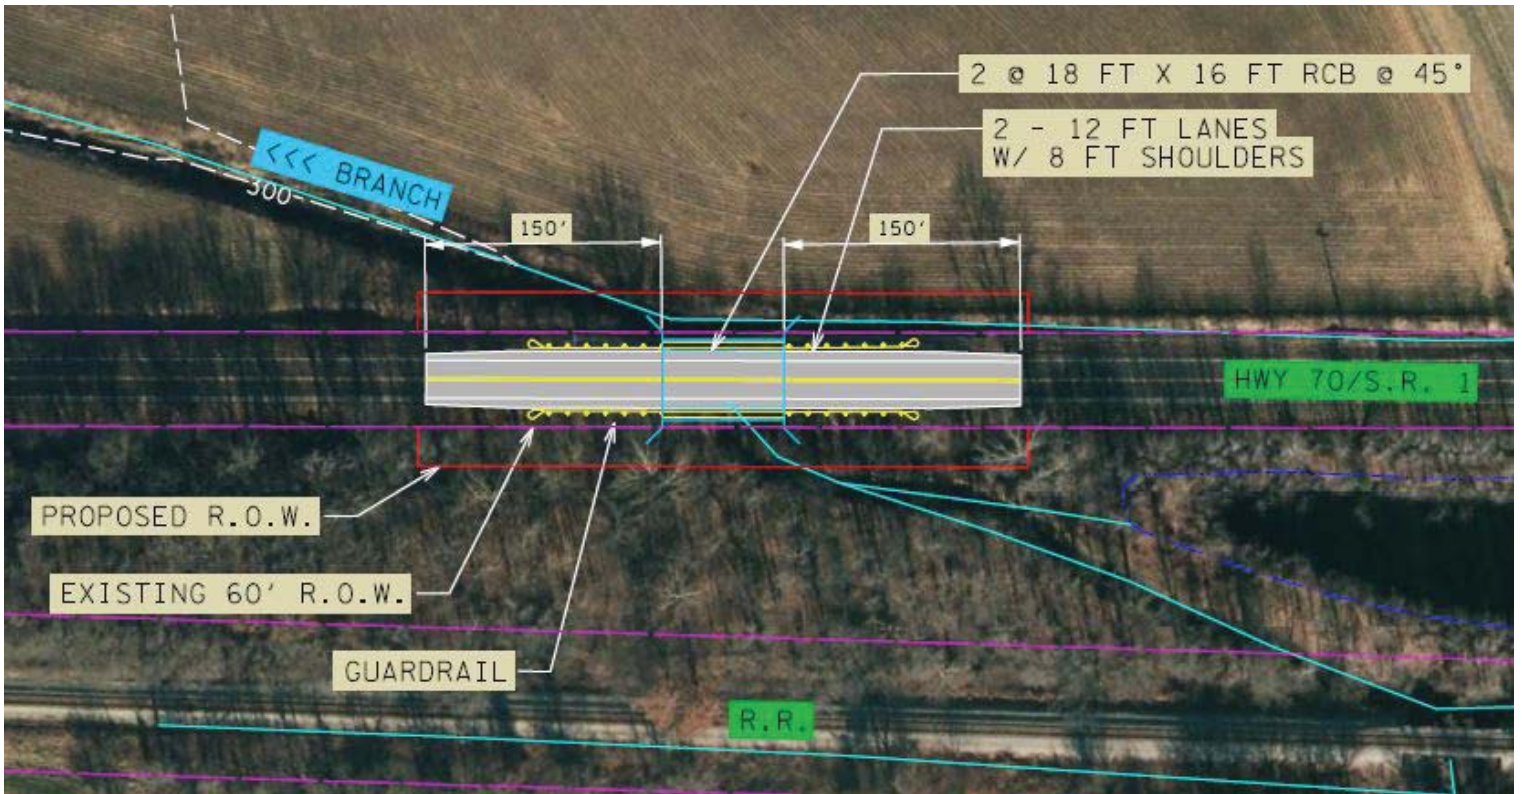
Proposed Bridge Aerial from TIR 04/02/2018.
